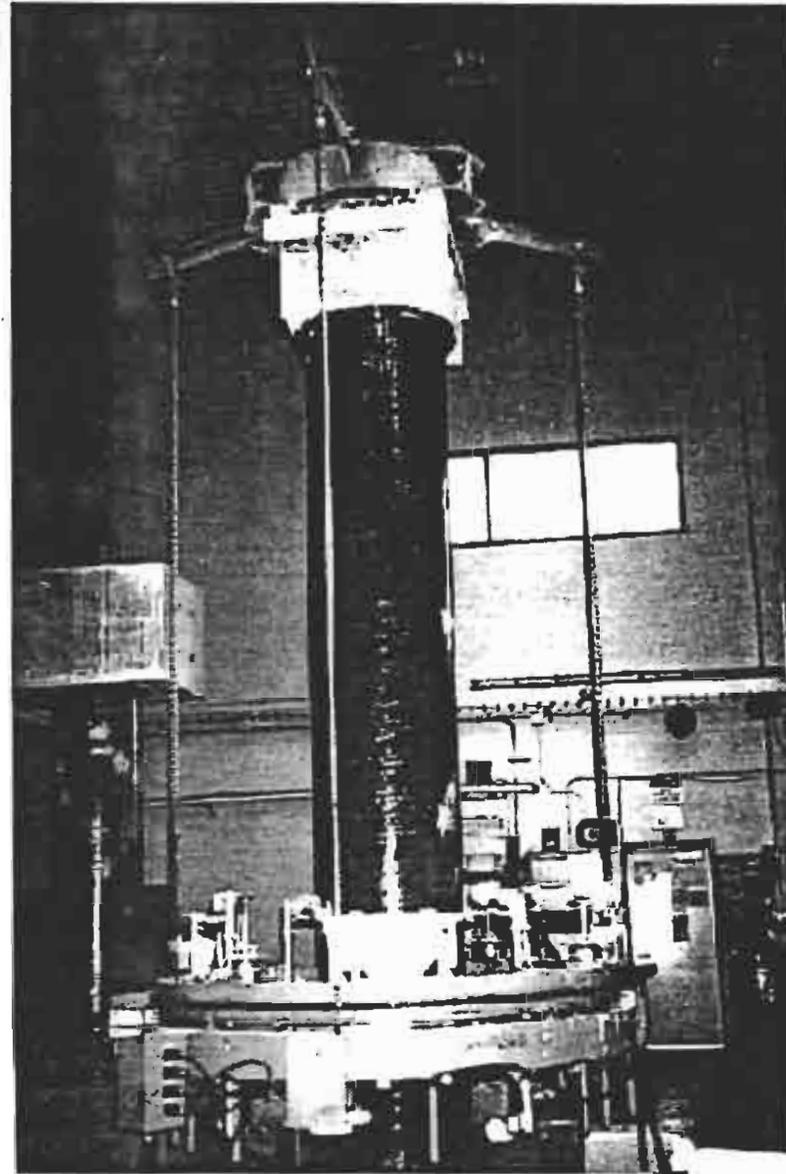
Jacket Application for Lap Splice Enhancement Circular Column CF-3
